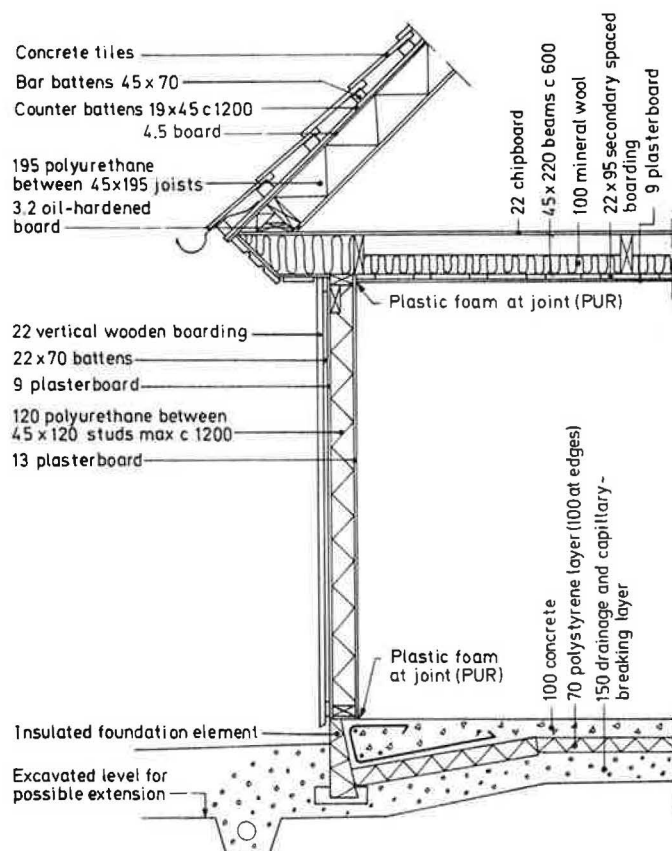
The picture above shows the house facades facing the street. The facades are of vertical wooden boarding. On the left, a cross-section of the house construction. The houses are prefabricated to a fairly high degree. The foundation elements, which are left in position, act as forms for the concrete slab which is cast on the spot. These foundation elements consist of a core of polystyrene foam surrounded by an outer layer of concrete reinforced with steel fibre and glassfibre
